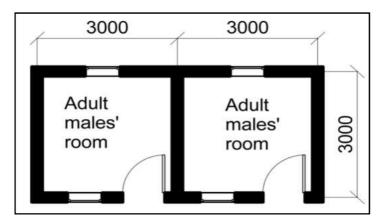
Floor Plan of Colonial Igala Two Rooms Adult Male Children's House. Source: Field Survey (2017).
